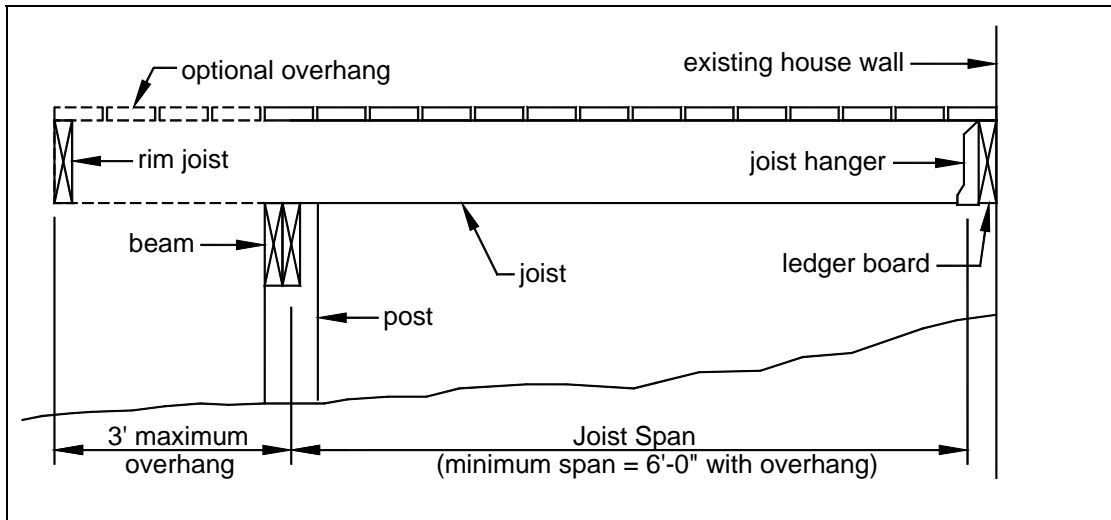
JOIST SPAN - DECK ATTACHED AT HOUSE
